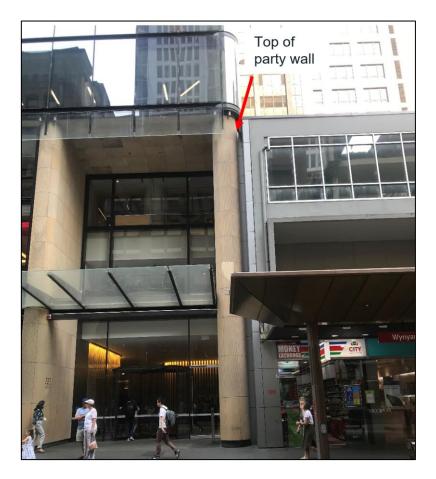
View of existing party wall from George Street, with top of party wall indicated
